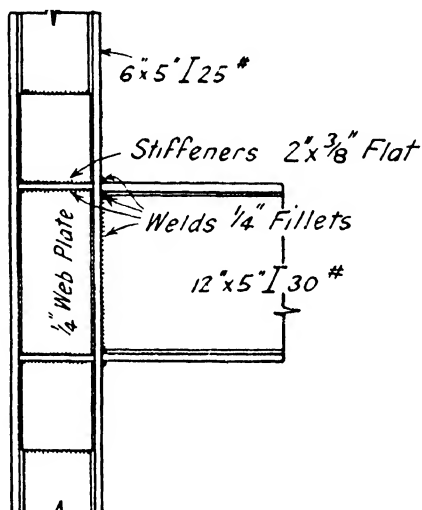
RIGID BEAM-TO-COLUMN CONNECTION
